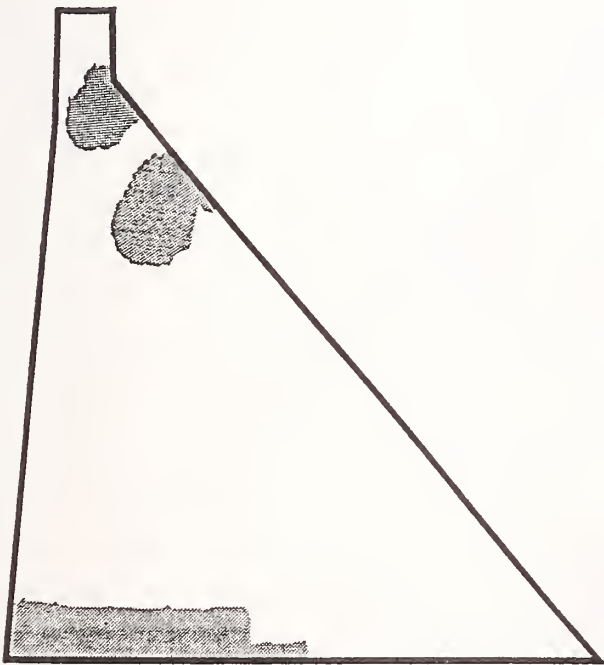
Cracked zones of Russell Dam with tripled Parkfield loading.
